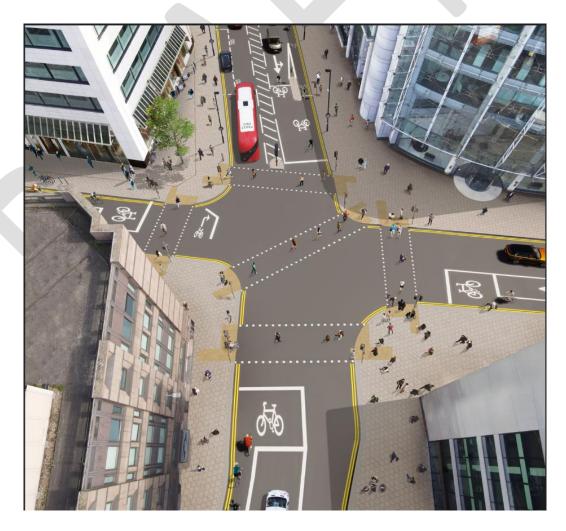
Ropemaker Street, Moorgate, Finsbury Pavement and South Place Junction crossing improvements (the red bus is on Finsbury Pavement)
